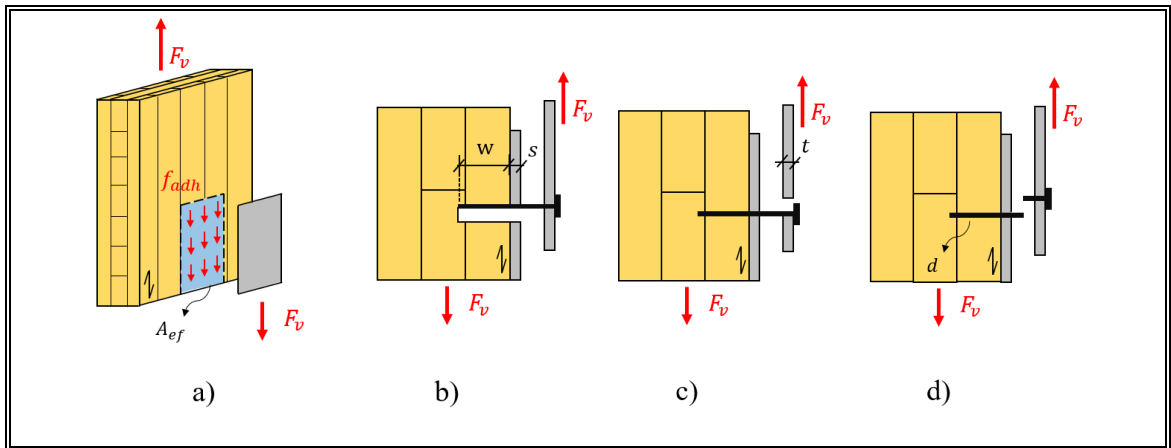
Undesirable failure modes: a) Epoxy interface failure; b) Timber-steel composite failure; c) Yielding of external steel plate; d) Fastener shear-off
